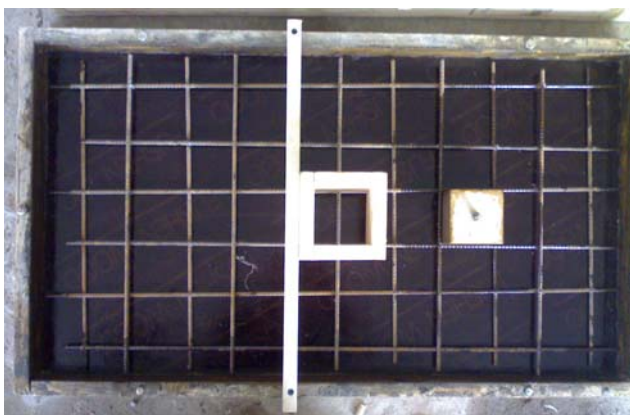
Details of mould of group AFig. 2b: Reinforcement of column
